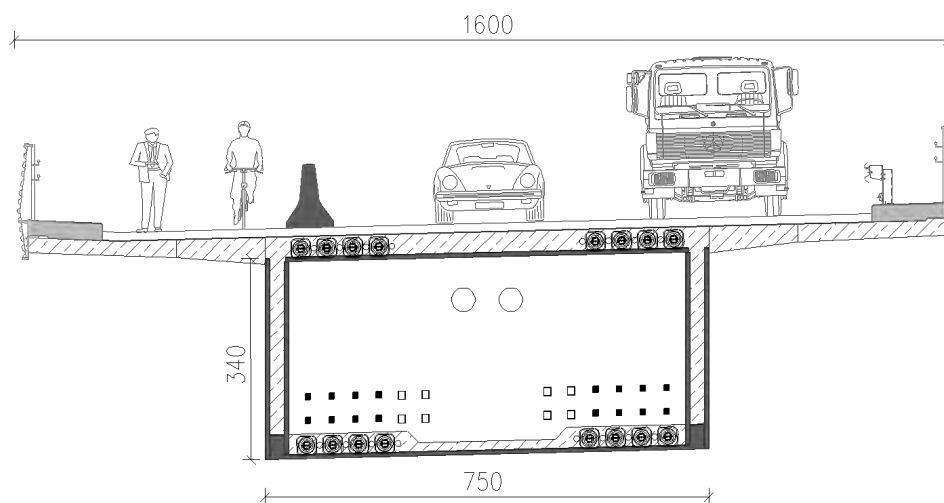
Standard cross-section for the bypass bridges over the Danube river in Linz. Lightweight box-sectioned bridge girder out of double wall elements and thin-walled precast elements shown in dark gray (FCP, 2014)
